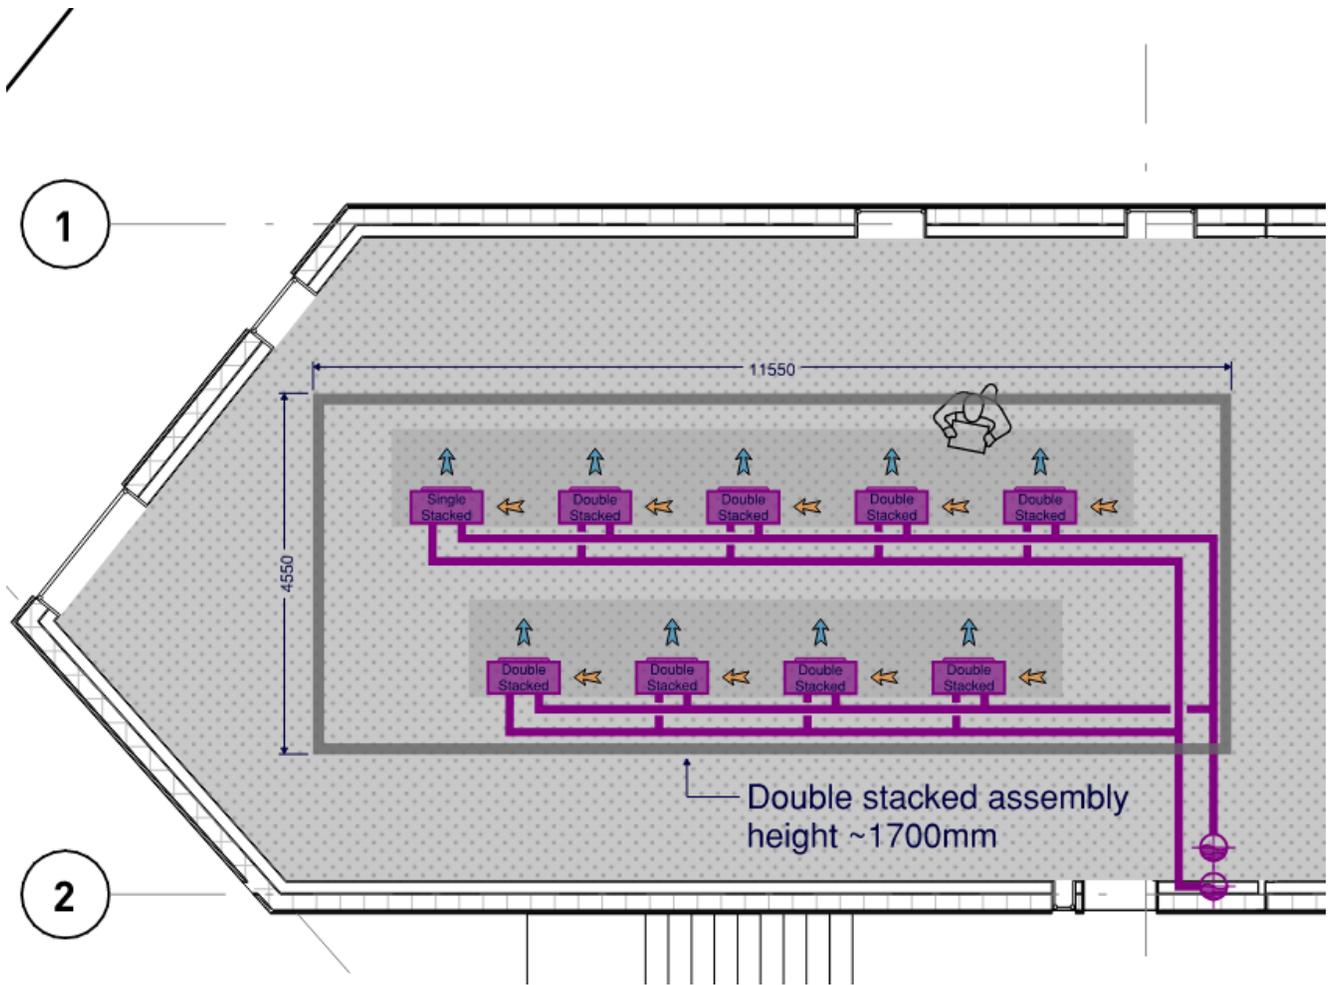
Vienna House Outdoor CO₂ Heat Pump, SANCO2
